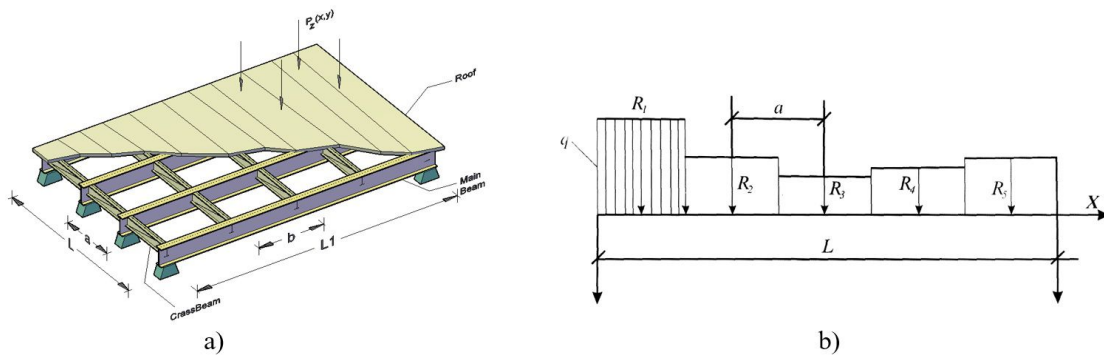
Girders in roof systems, cross beam reactions on the main beam, a) main girders, b) Secondary girders
